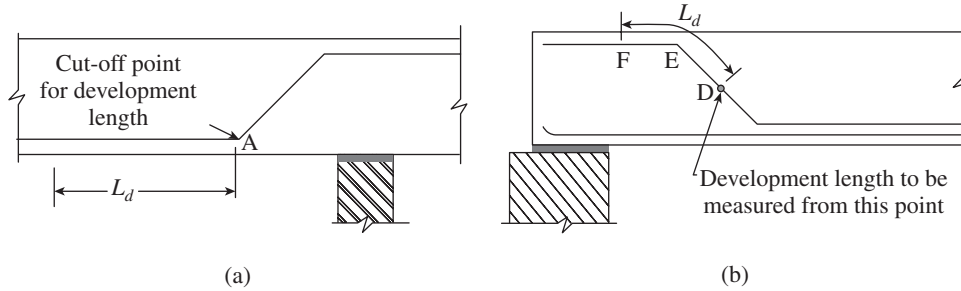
Anchoring bent-up bars (a) Tension zone (b) Compression zone
